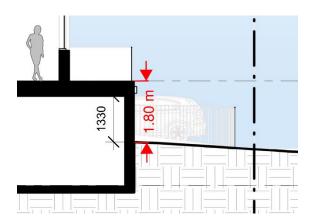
excerpt of section 3 from sheet DA203 of the architectural plans showing the extent to which the building's ground floor level must be raised to comply with the flood planning level
